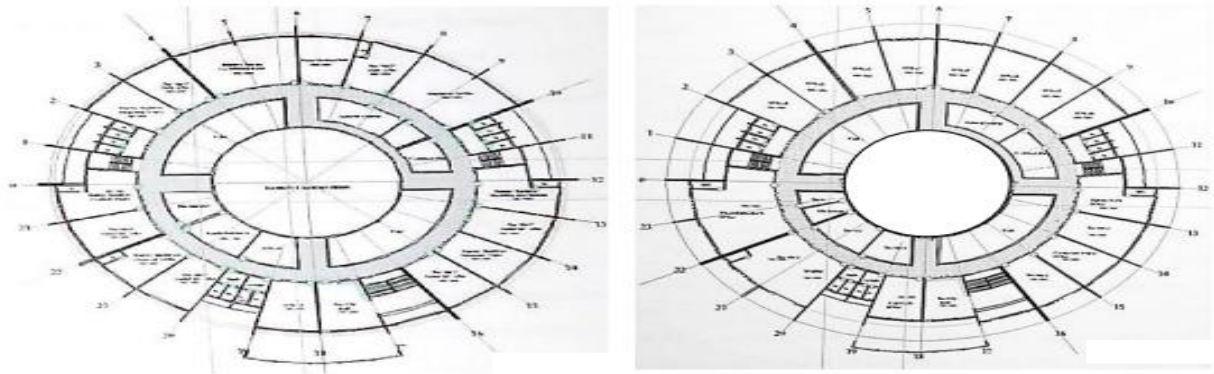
Ground second and third floor plan of LAUTECH Senate Building (Source –Author’s field work)
